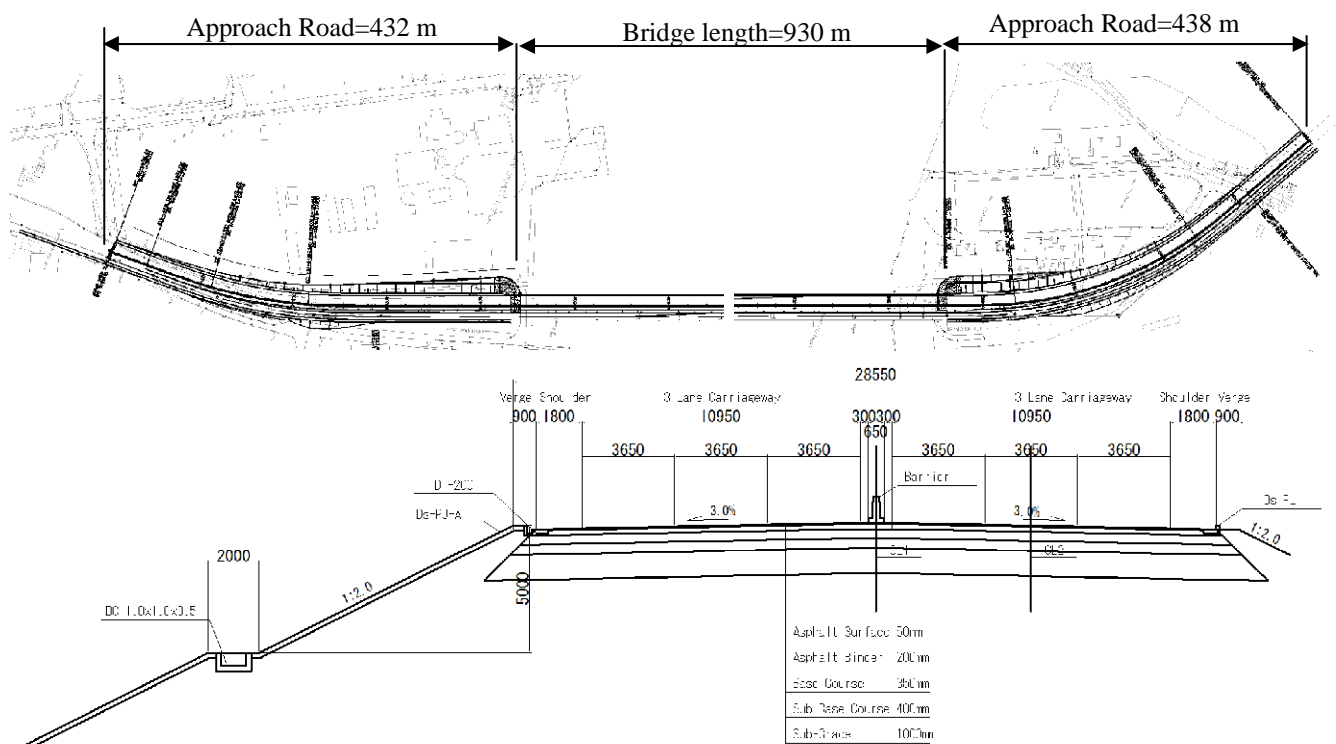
Plan and typical cross section of approach road (2nd Meghna Bridge)
